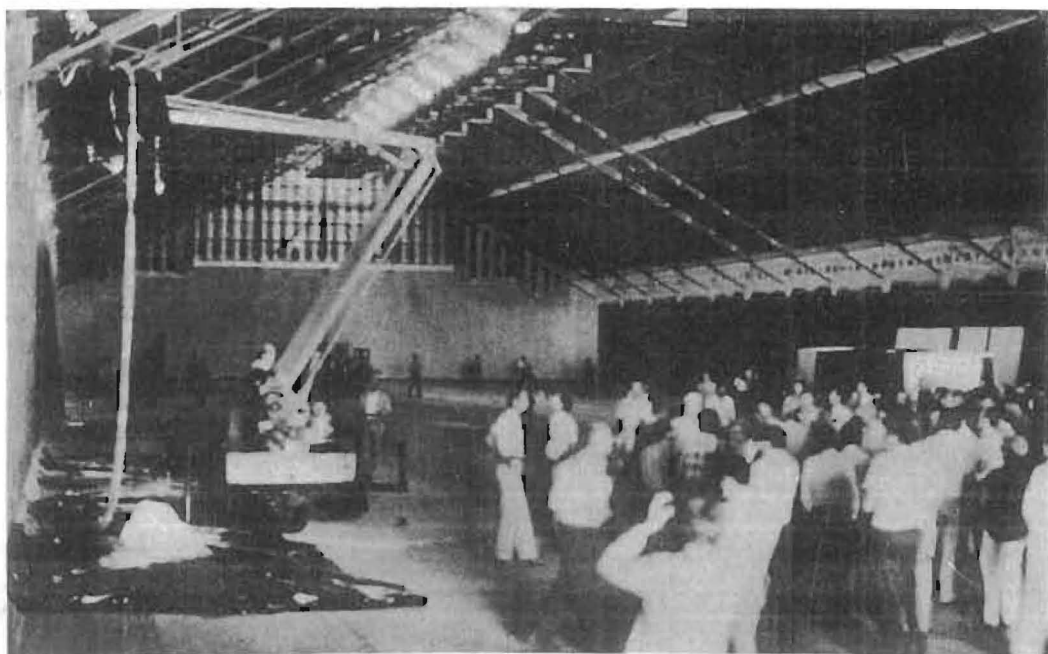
Interior view of Meckering horizontal storage showing applications of polyurethane foam to the roof/wall joints.
